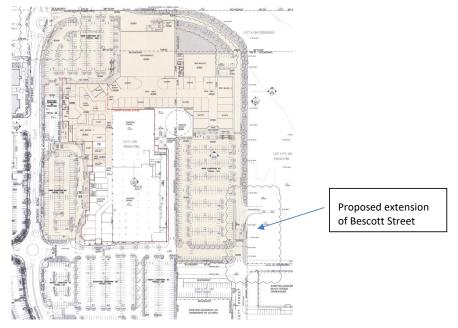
Section of endorsed plans forming part of Planning Permit P2008-311
